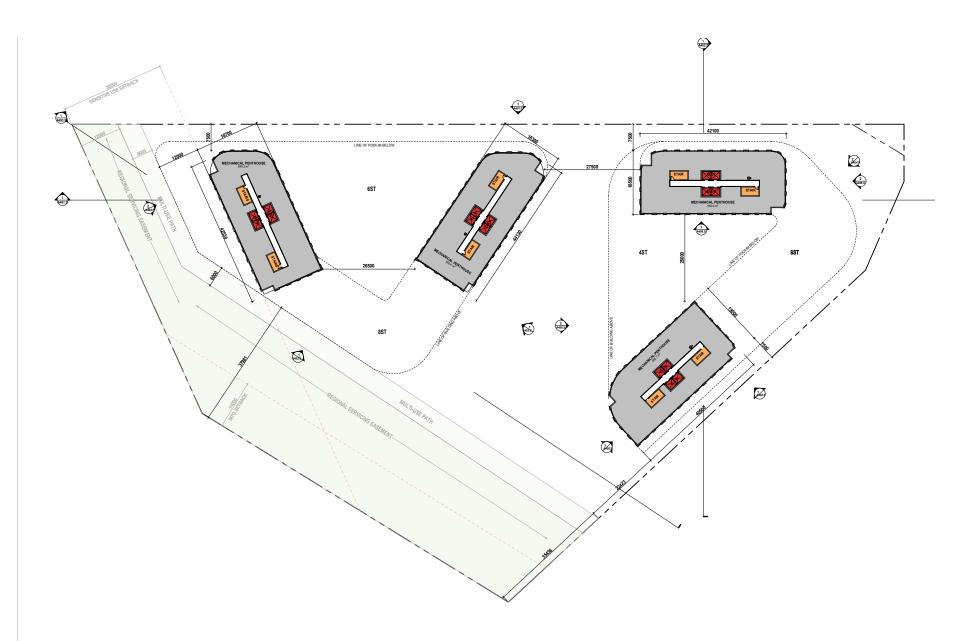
MPH Floor Plan (BDP. QUADRANGLE ARCHITECTS LTD.)
